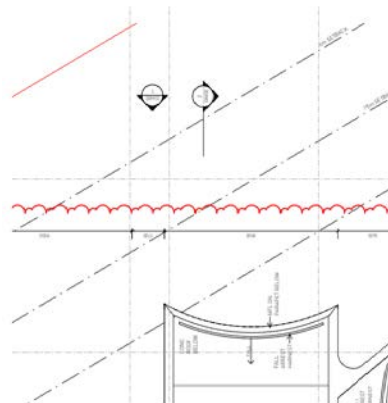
Corner of Building B tower encroaching within Spurway Drive Setback
